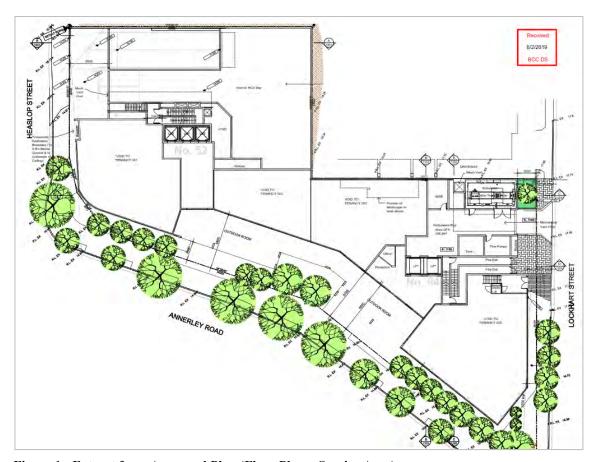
Extract from Approved Plan (Floor Plan – Service Area)
